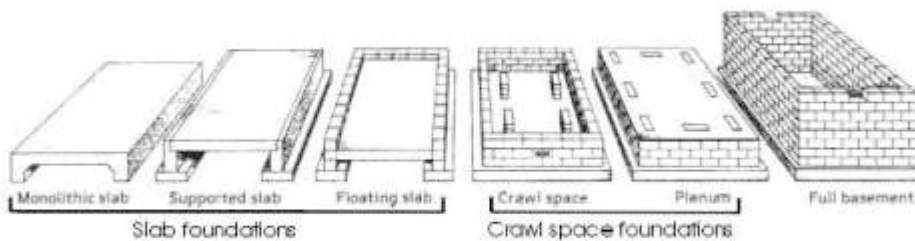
Foundation types (*Handbook of Pest Control, 7th Edition, [original figure slightly modified]*)
